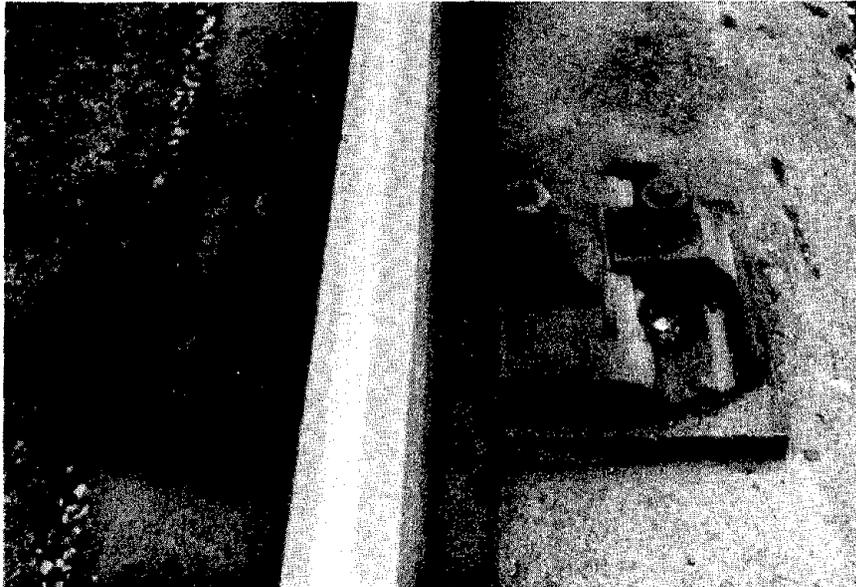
FRENCH RAILWAYS FASTENER AT
